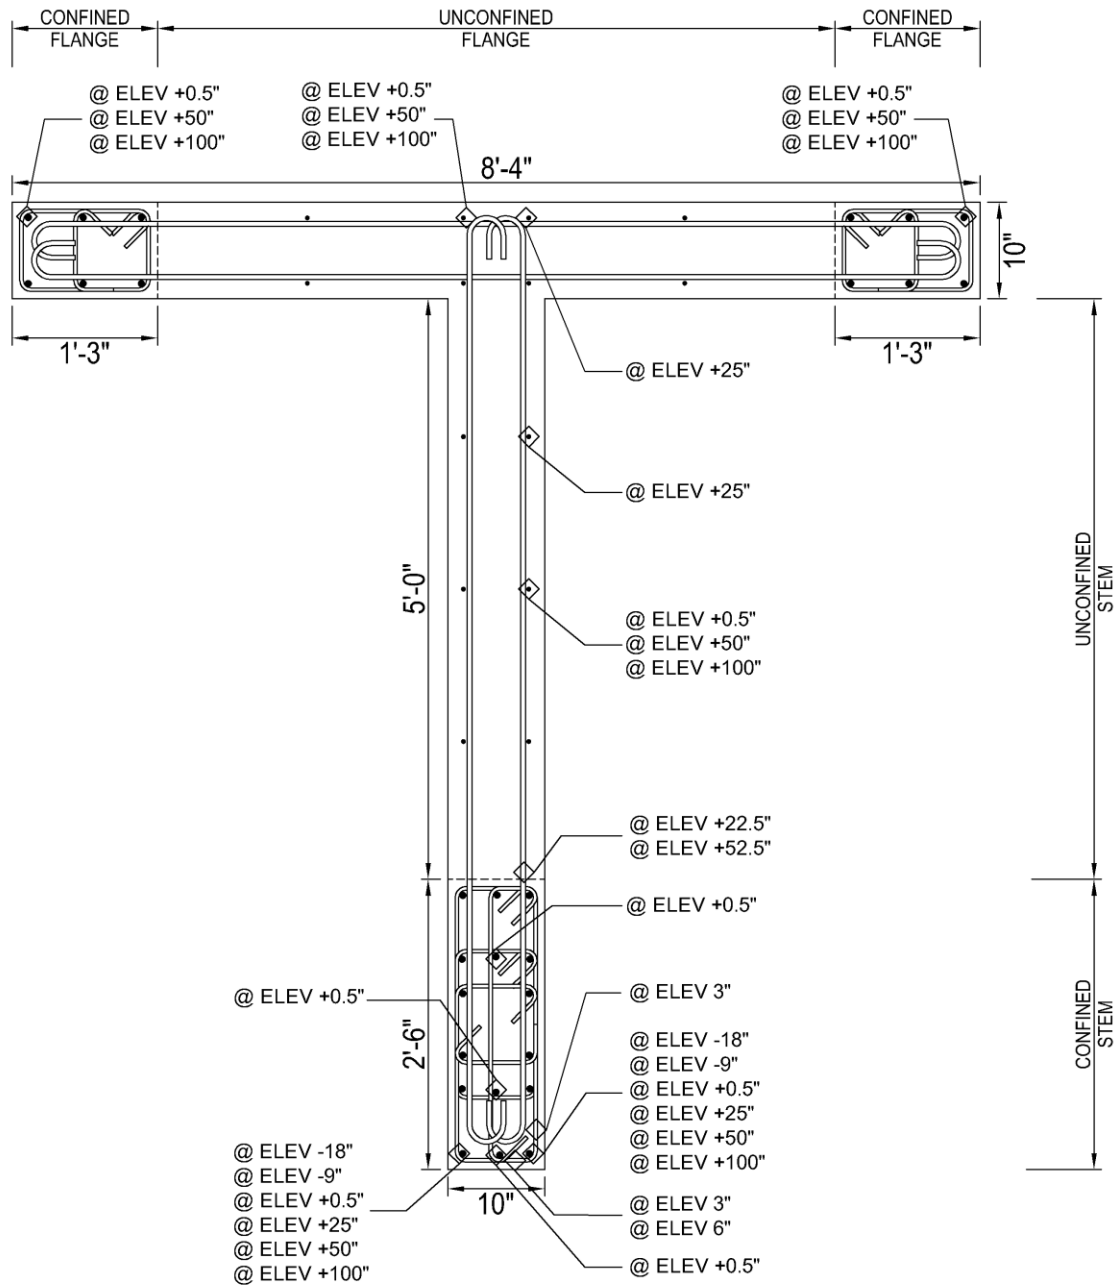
Wall T2 strain gauge locations (1 in. = 25.4 mm)
